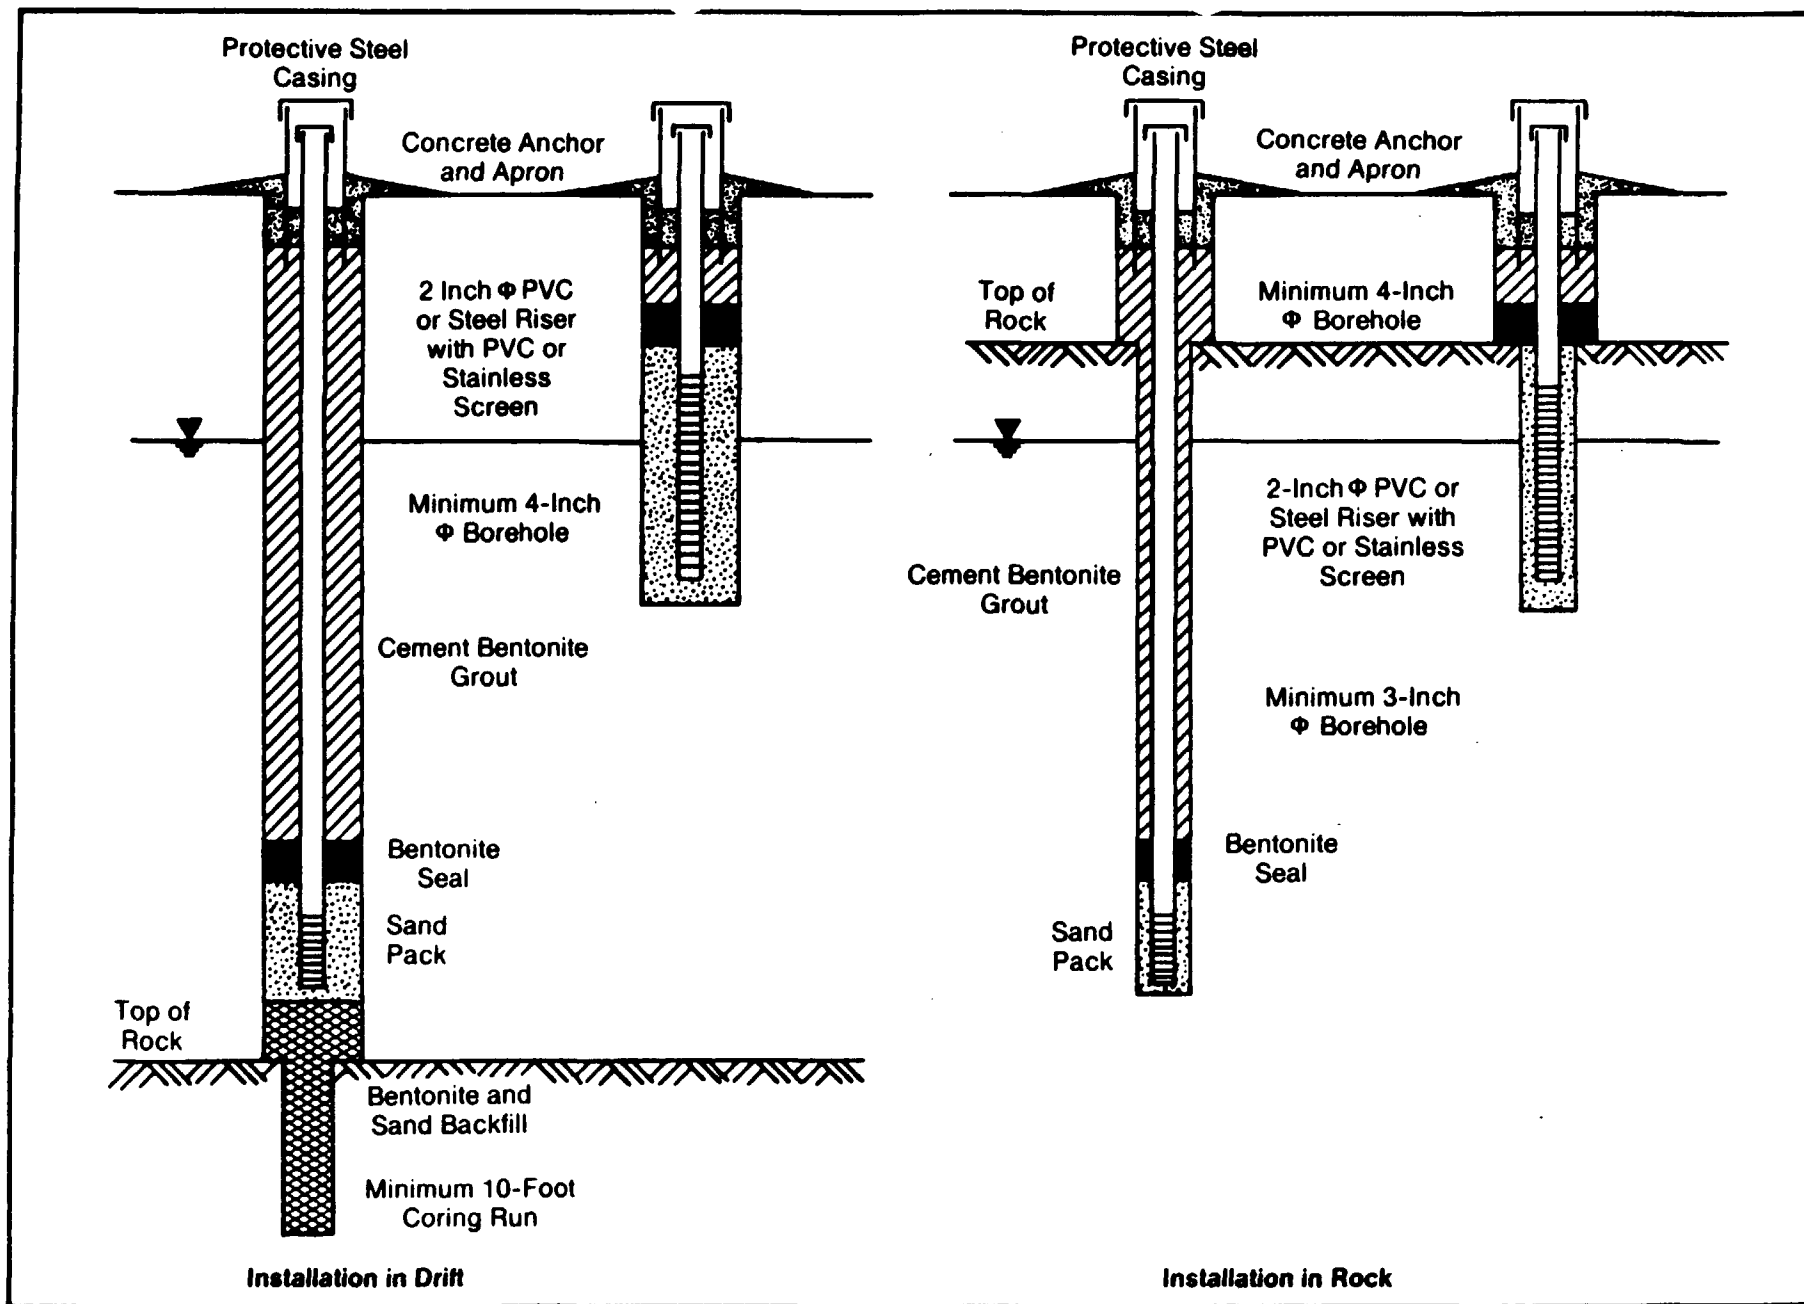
CONSTRUCTION DETAILS - TWO WELL NESTS
